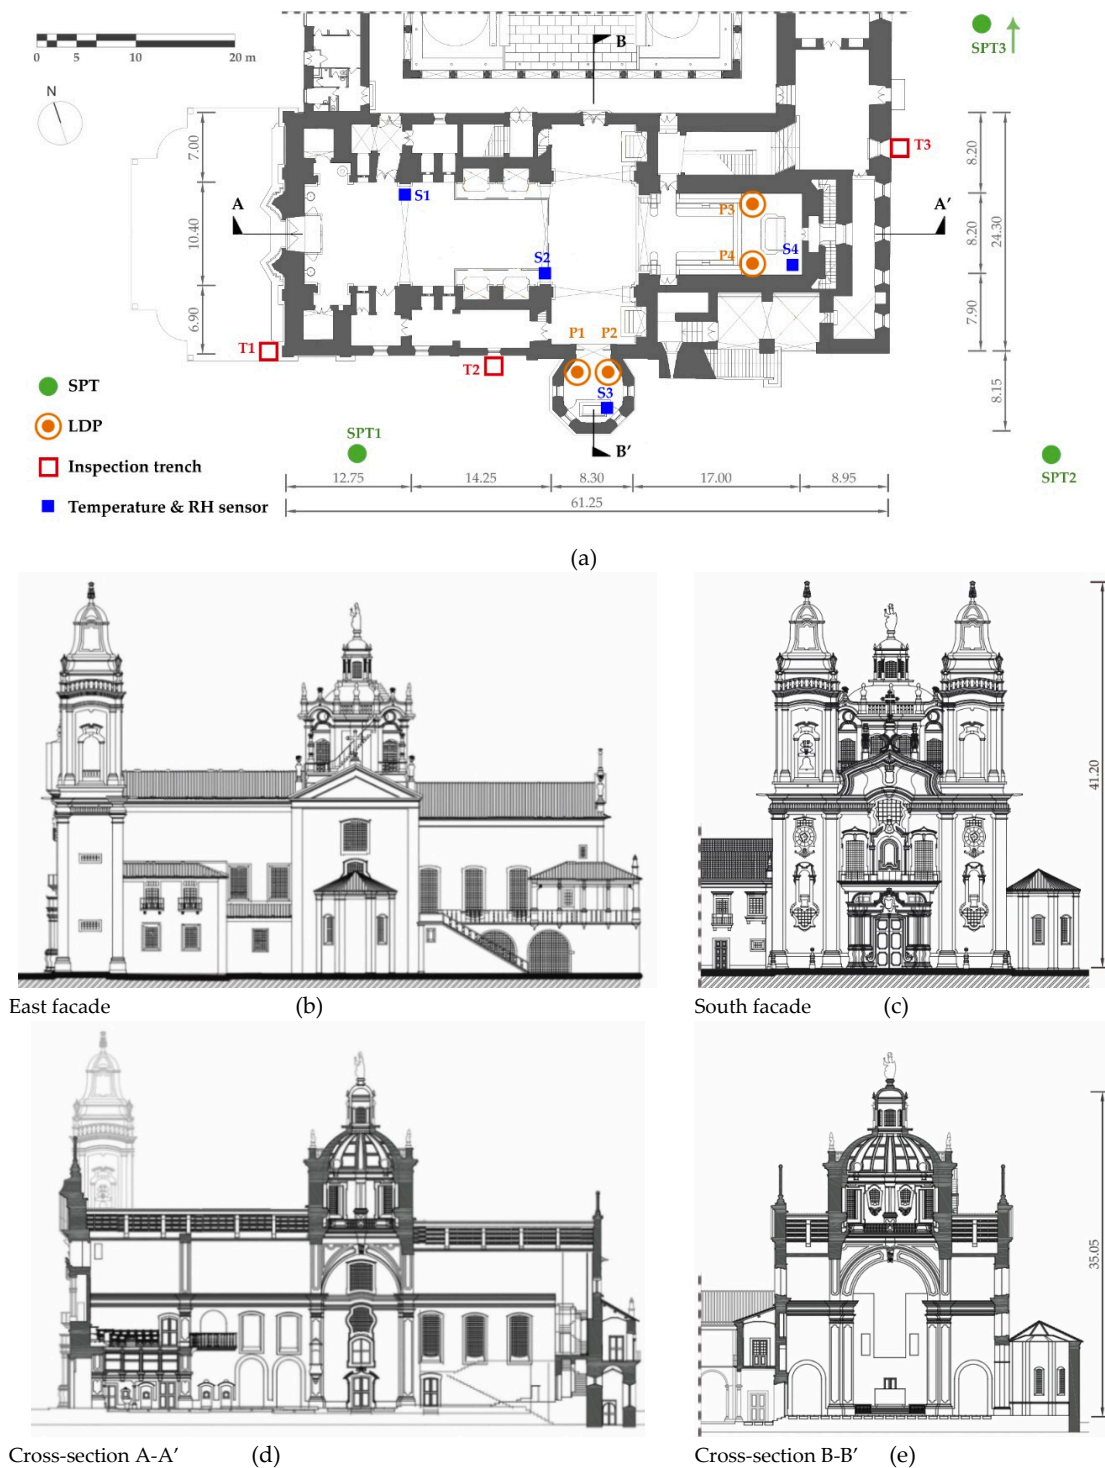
Architectural definition of the church of São Miguel de Refojos: (a) ground floor plan, (b) longitudinal elevation, (c) front elevation, (d) longitudinal cross-section, (e) transversal cross-section. Dimensions in m.
